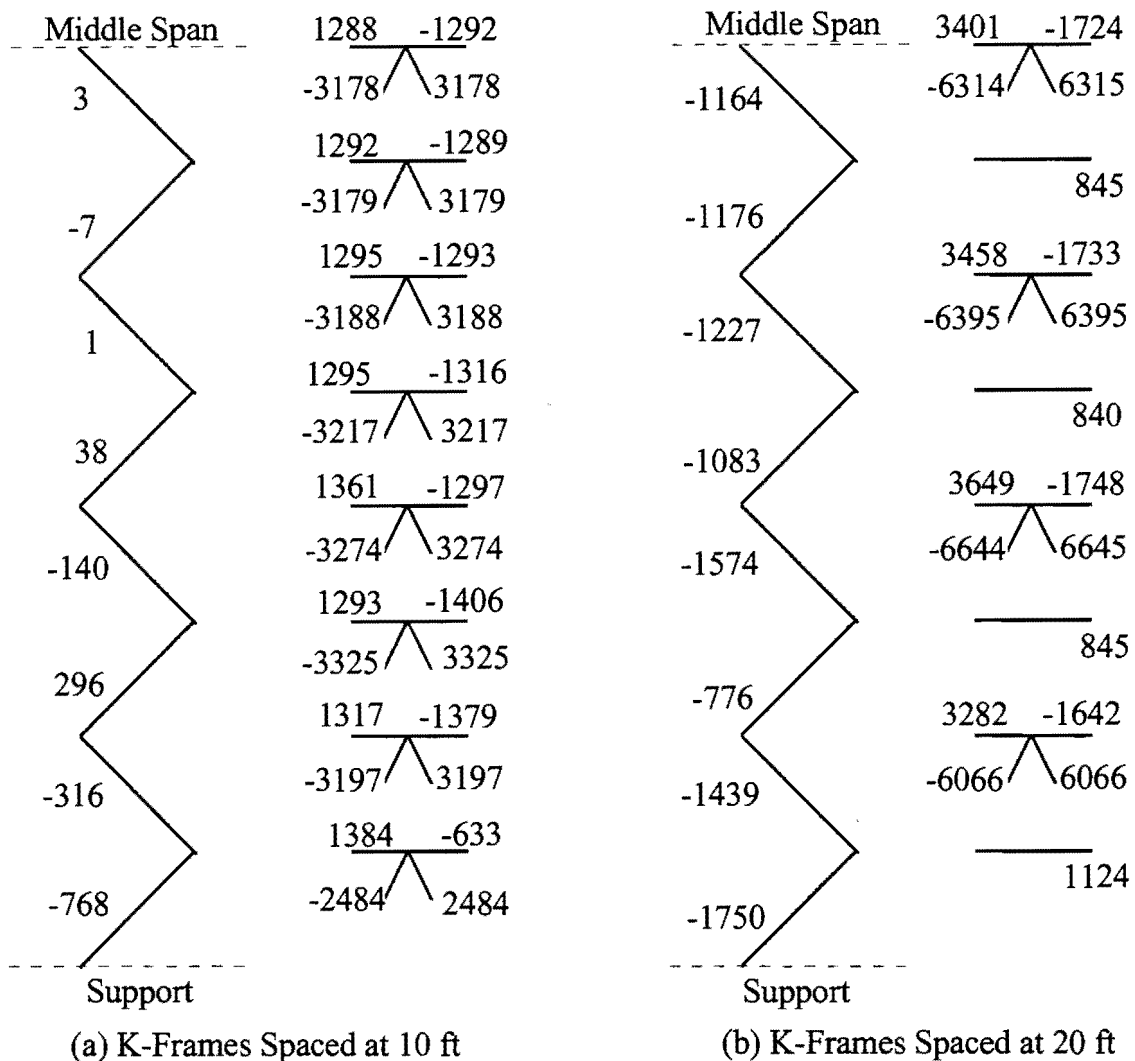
Brace Forces Due to Distortional Loads in Box Girders with SD-type Top Flange Truss System (lbs)
